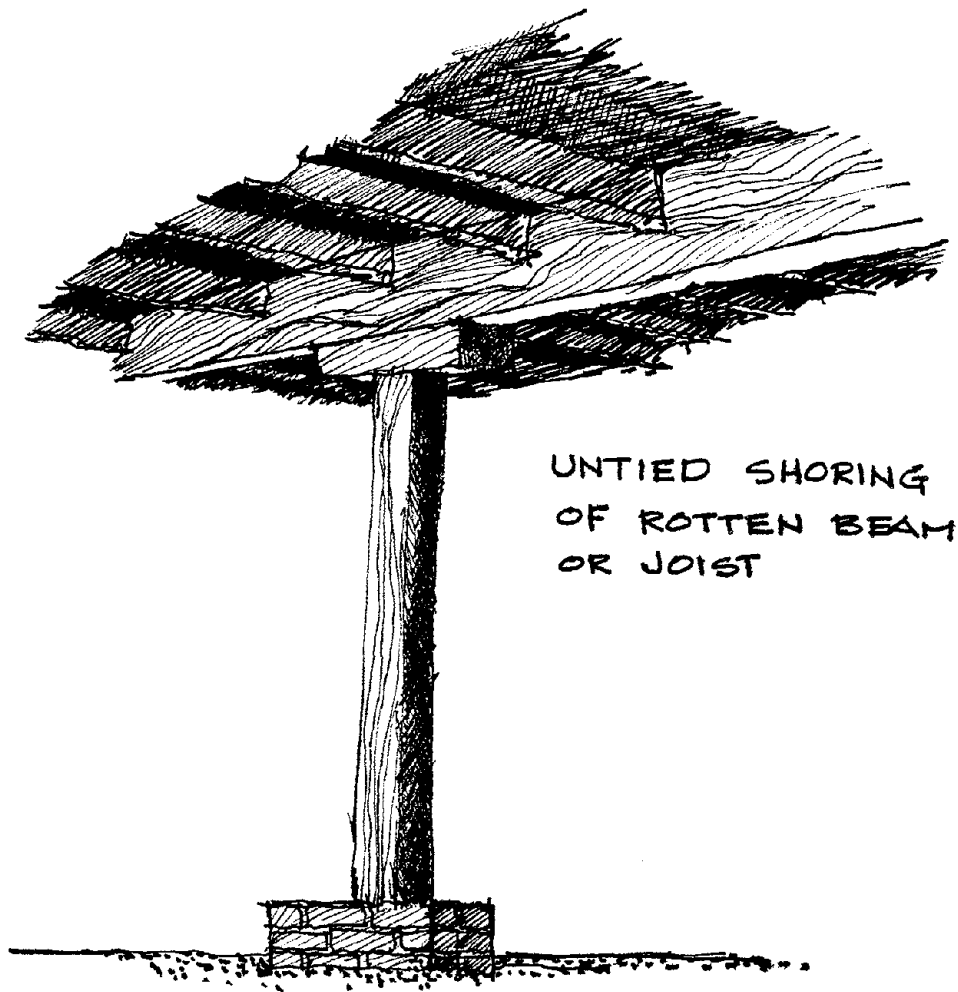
Diagram of shoring of joist or beam that had become rotten because of the presence of water and the lack of ventilation in basement foundations. This condition of shoring was found in many of the case study buildings. The shoring was typically untied and may not withstand the strong lateral forces that could occur with an earthquake.
